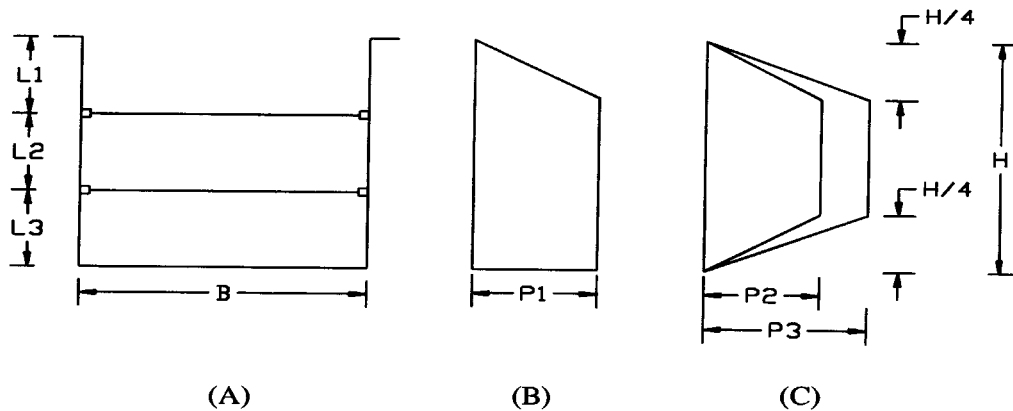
A) Excavation Support System; B) Apparent Pressure Diagram for $N > 4$; C) Apparent Pressure Diagram for $N < 4$
